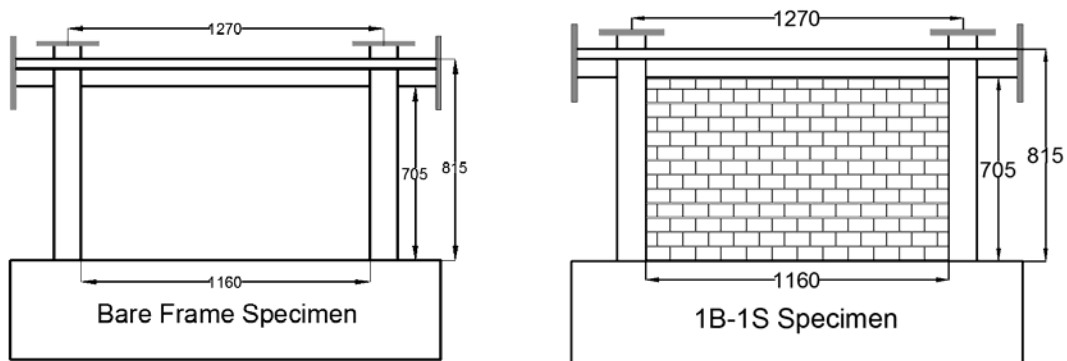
Details of Bare Frame and 1B-1S Specimen (all dimensions are in mm)
